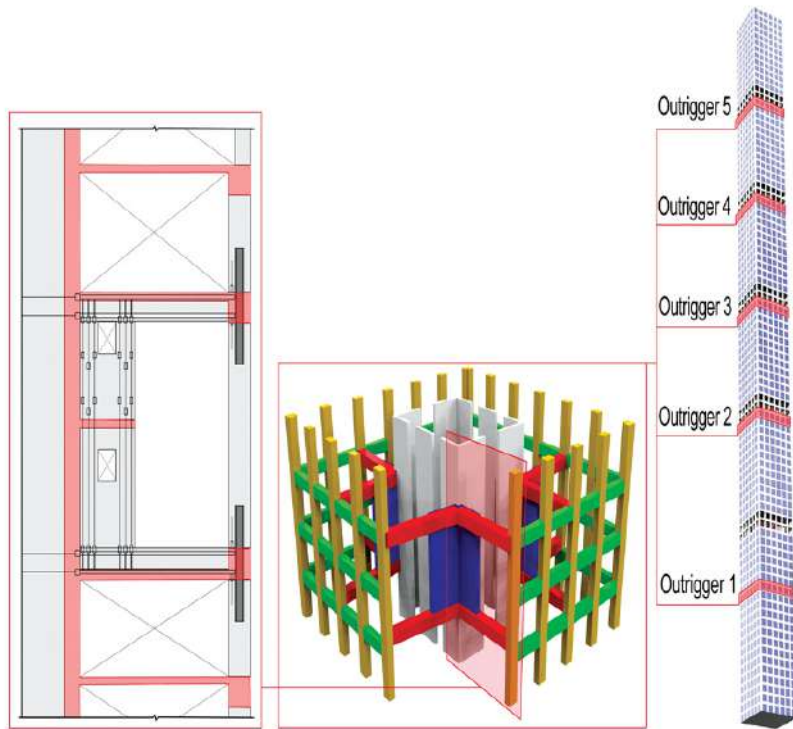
General depiction, structural detail and location of outriggers[59]
